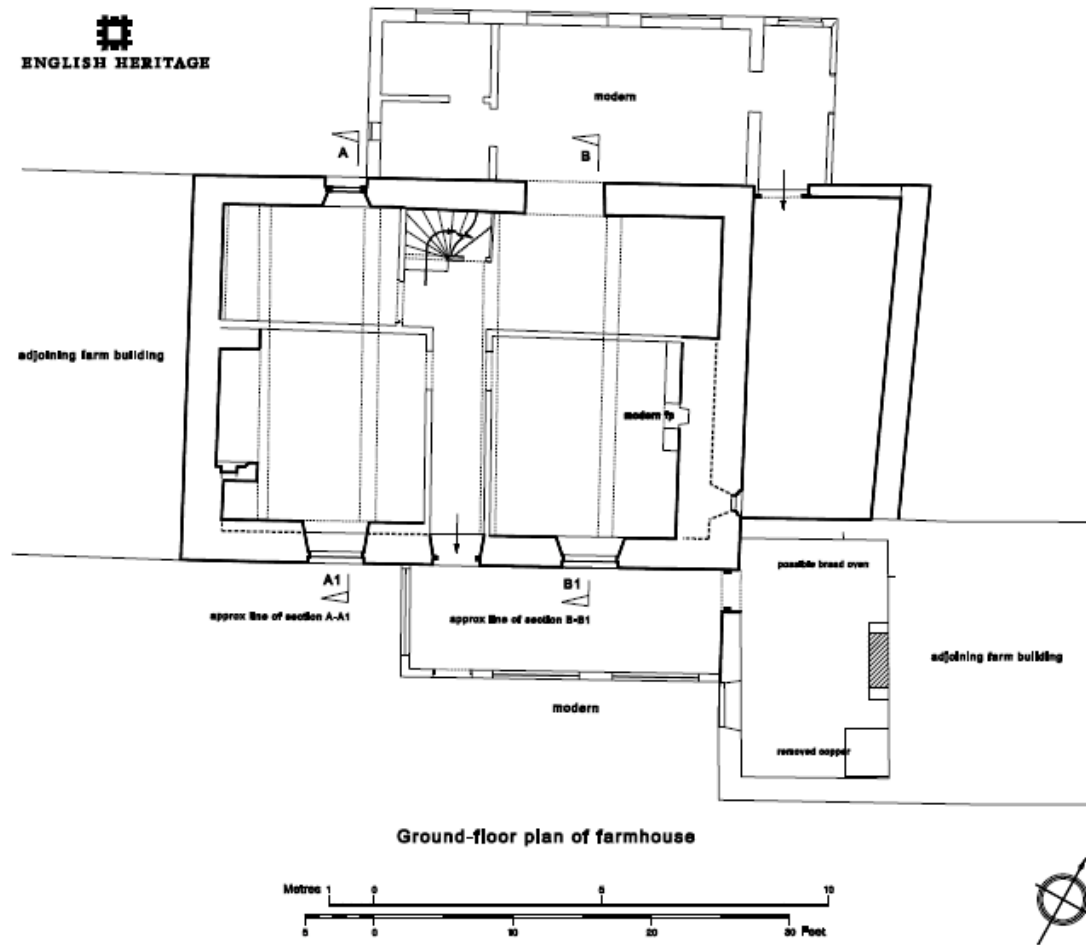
Ground-floor plan showing layout of building and location of section drawings (Barry Jones)
